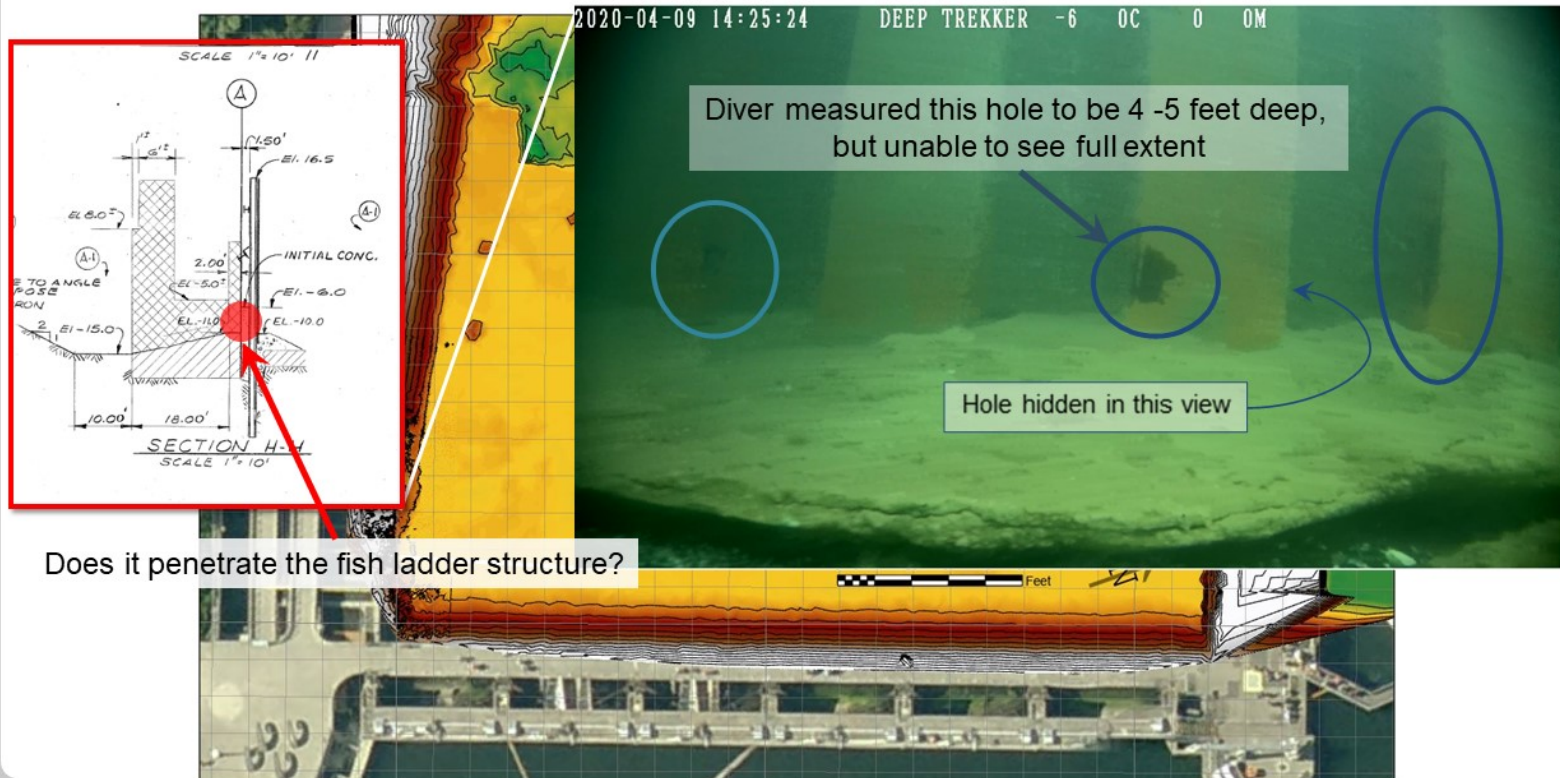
Holes in the sheet pile wall of the fish ladder with voids of unknown extent behind them.
